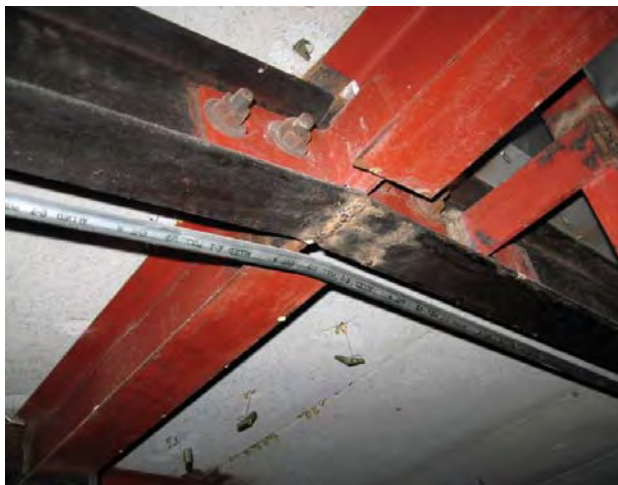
Close up view of connections between wrought iron framing and steel retrofits of south wing mansard roof framing.
